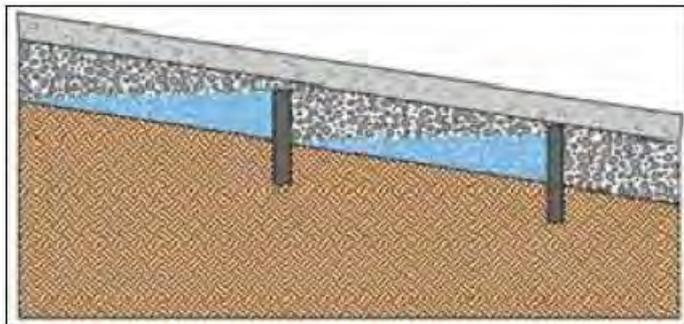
A. A "CHECK DAM" APPROACH MAY BE USEFUL IN LONG, SLOPED PAVEMENTS.
